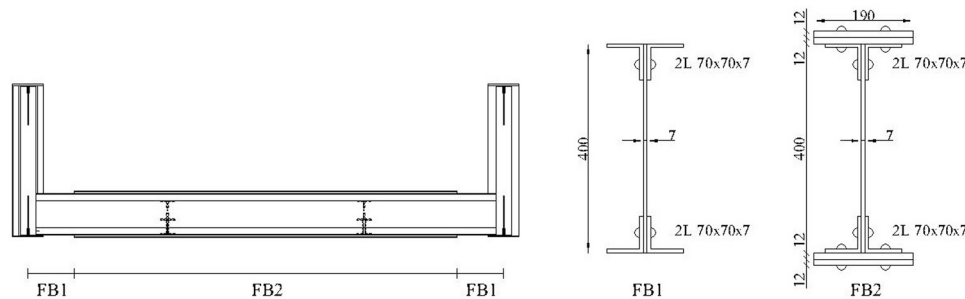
Retrofitting of Bridge A floor beams in 1927. Rivets of 20 mm with a separation of 60 mm are used for the retrofitting of floor beams. Original drawing from EFE [97], redrawn by the authors.
